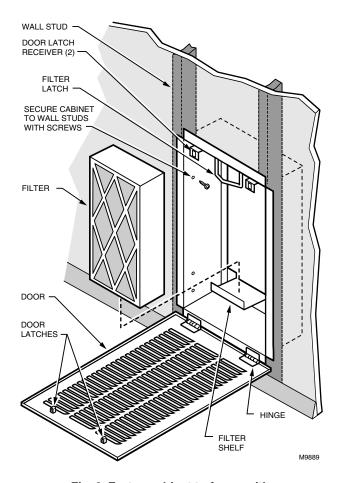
Fasten cabinet to frame with sheet metal screws (louvered model shown).
